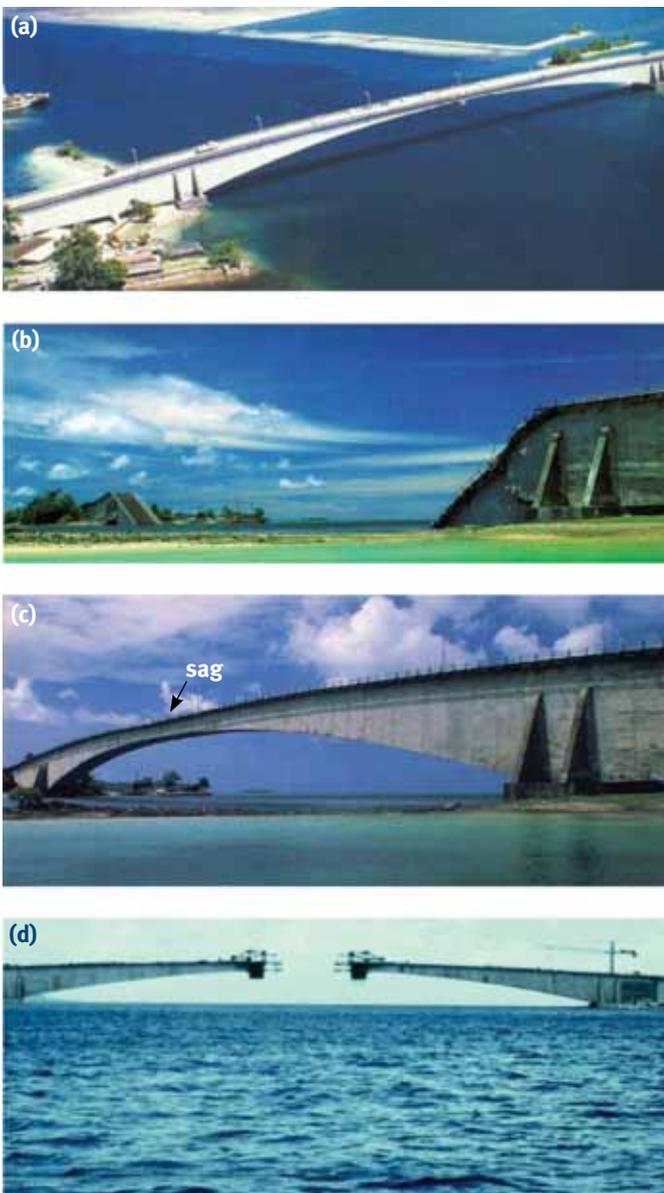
(a) KB Bridge, connecting Koror and Babeldaob Islands in the Republic of Palau; (b) collapse of KB Bridge; (c) excessive deflection of KB Bridge; and (d) erection of the cantilever box girders of KB Bridge
